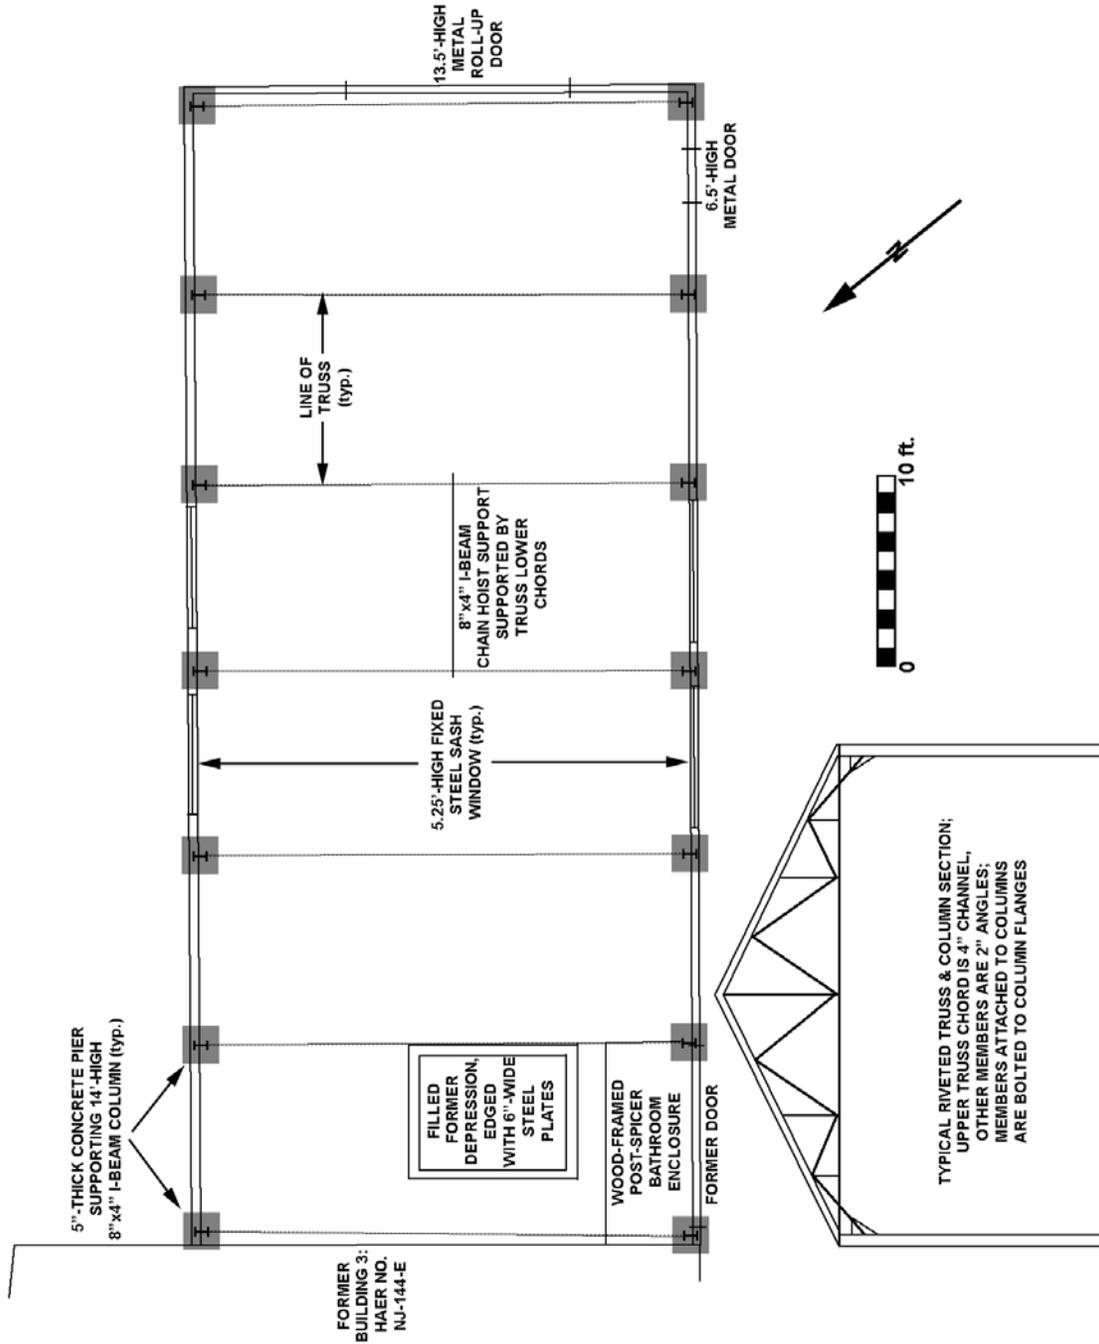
SKETCH PLAN AND TRUSS CROSS SECTION
